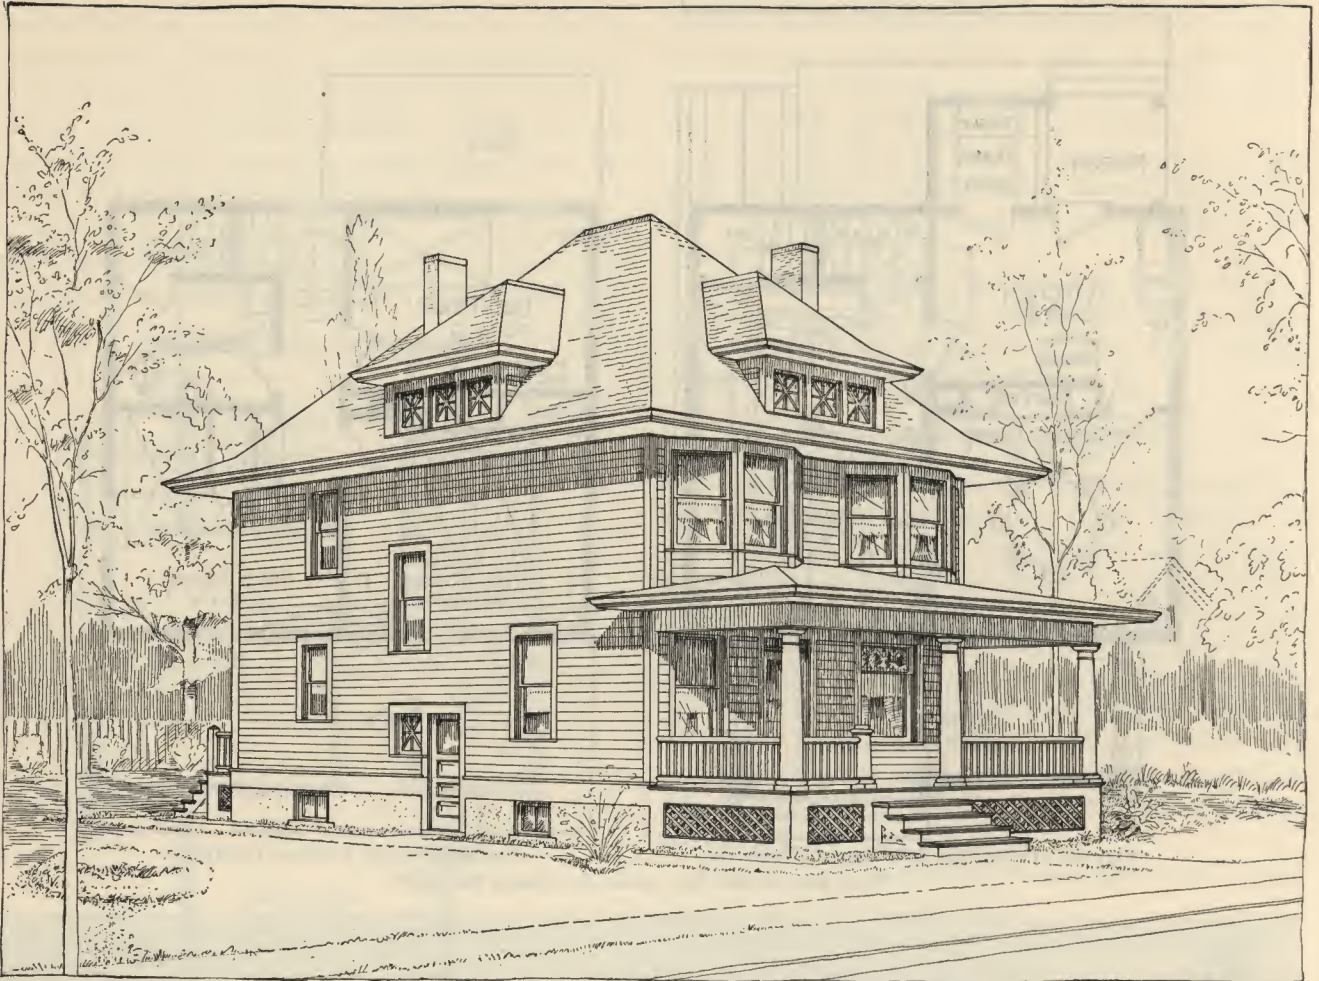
Perspective shown in line drawing. Design No. 6554.
